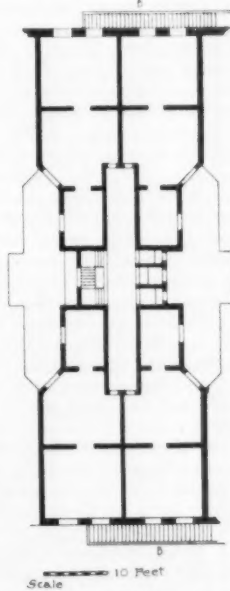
Plan of a New York Tenement-house; BB, Escape Balconies.
